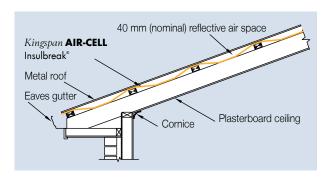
Side elevation of *Kingspan* AIR-CELL Insulbreak® in a metal roof with a raked ceiling
